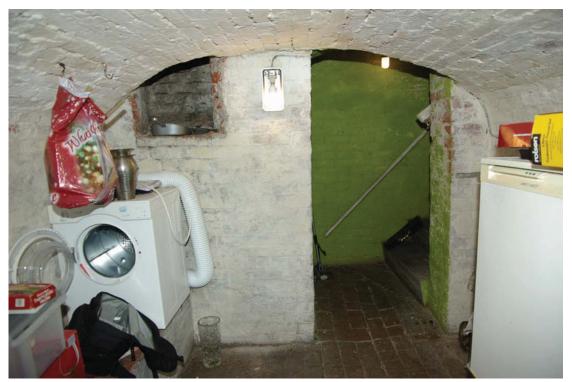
Cellar, with ventilated alcove and stairs up to kitchen. Looking west.
